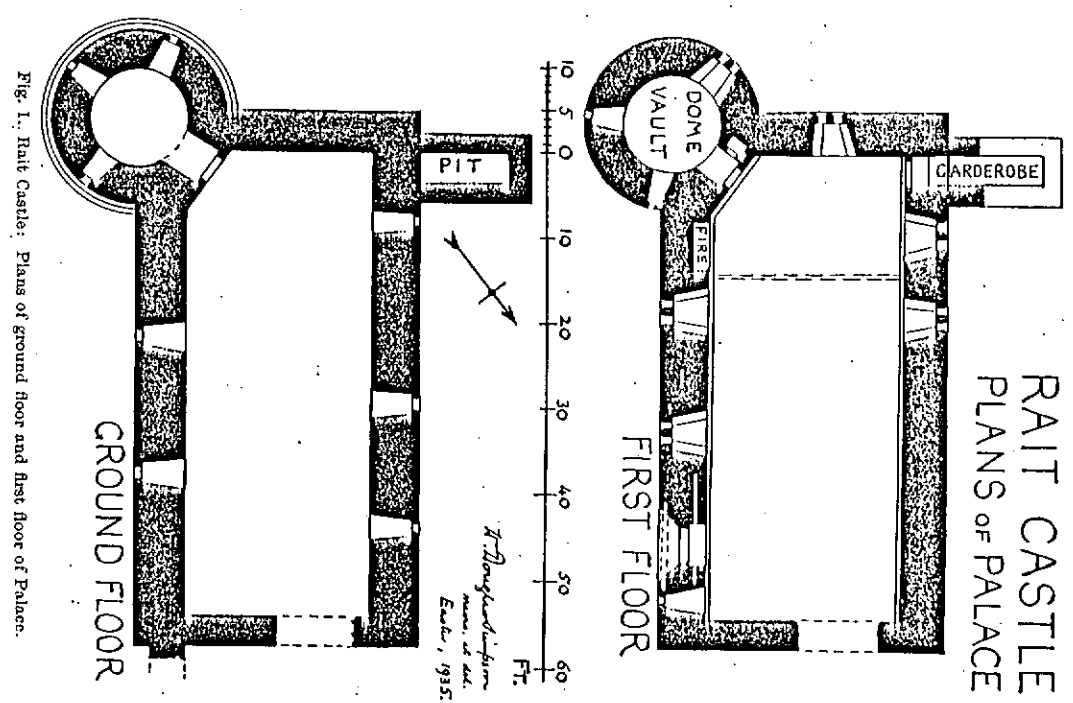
Rait Castle: Plans of ground floor and first floor of Palace.
